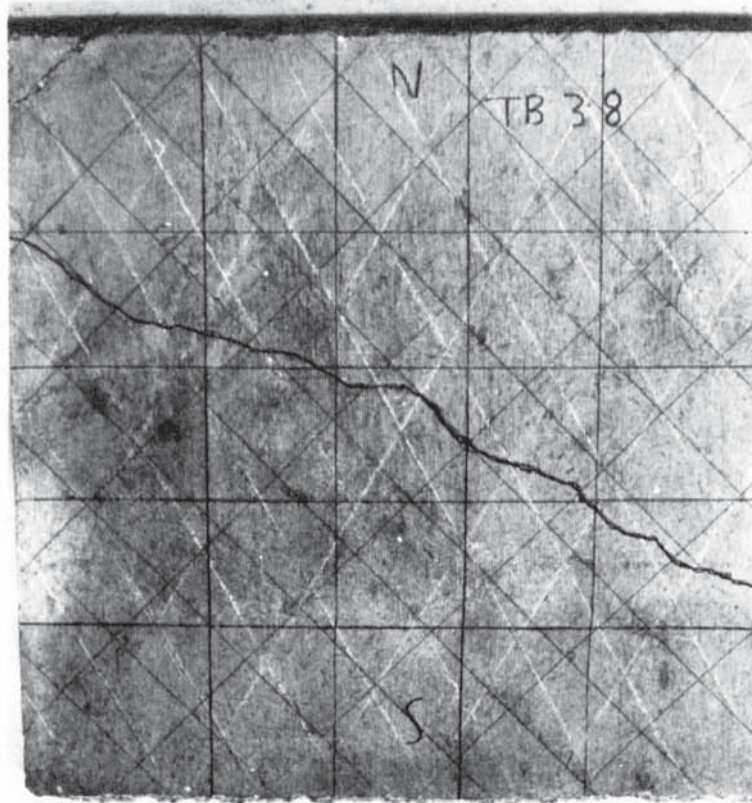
SINGLE CRACK FAILURE (SPECIMEN TB 38)
